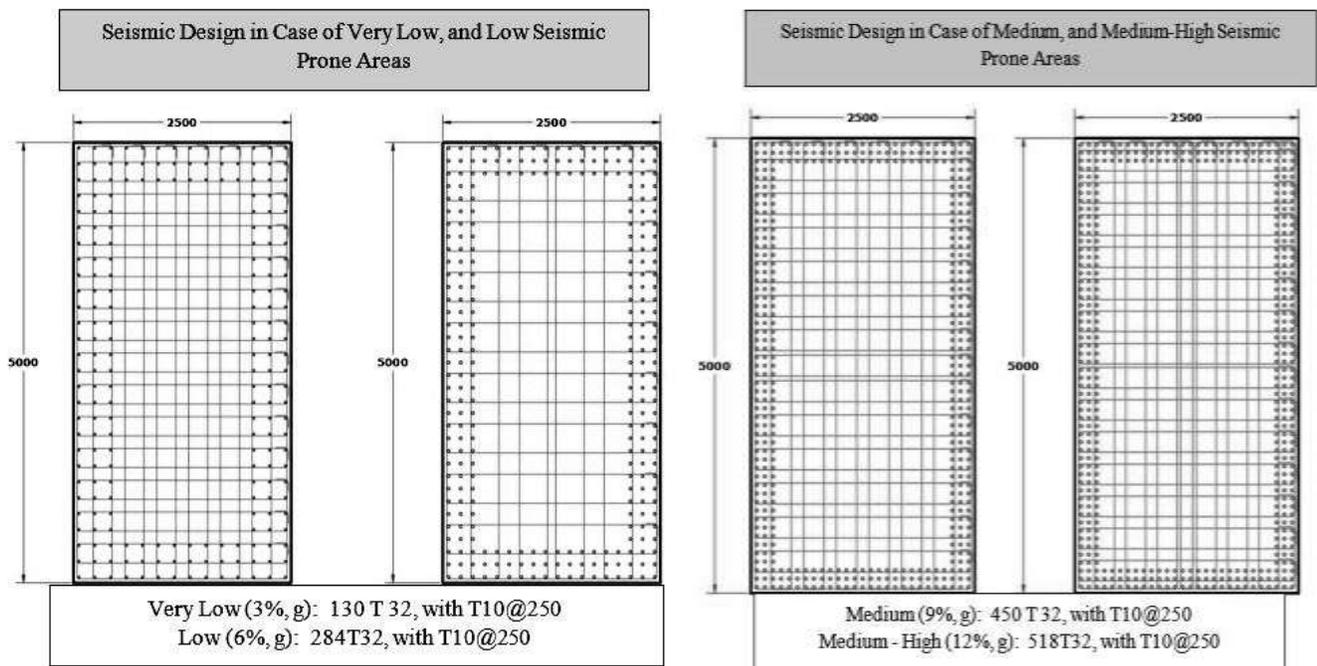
Reinforcement detailing for the pier rectangular section in 4 seismic hazard scenarios.
